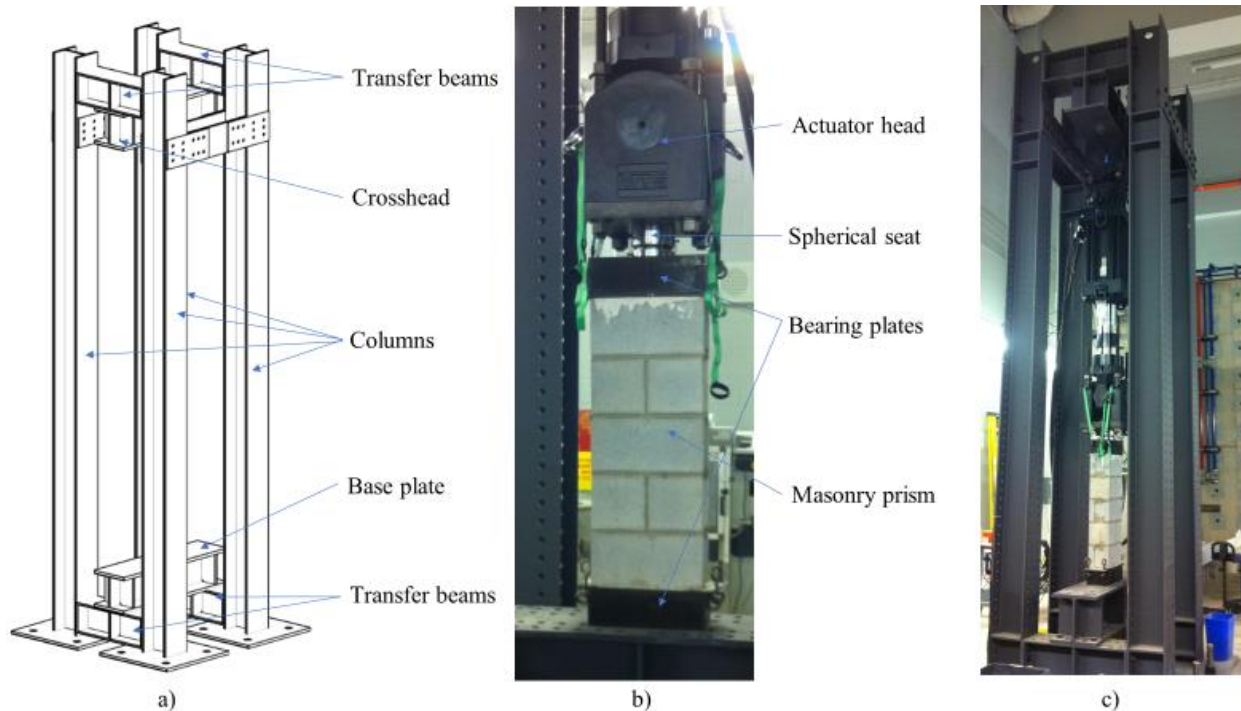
Axial loading frame: a) annotated drawing of bare frame; b) bearing plates for prism tests; and c) prism test in progress
